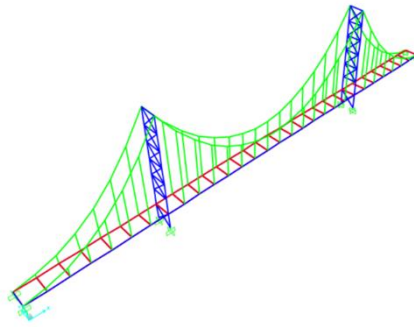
3D View of Suspension Bridge with vertical Hangers with braced pylons
